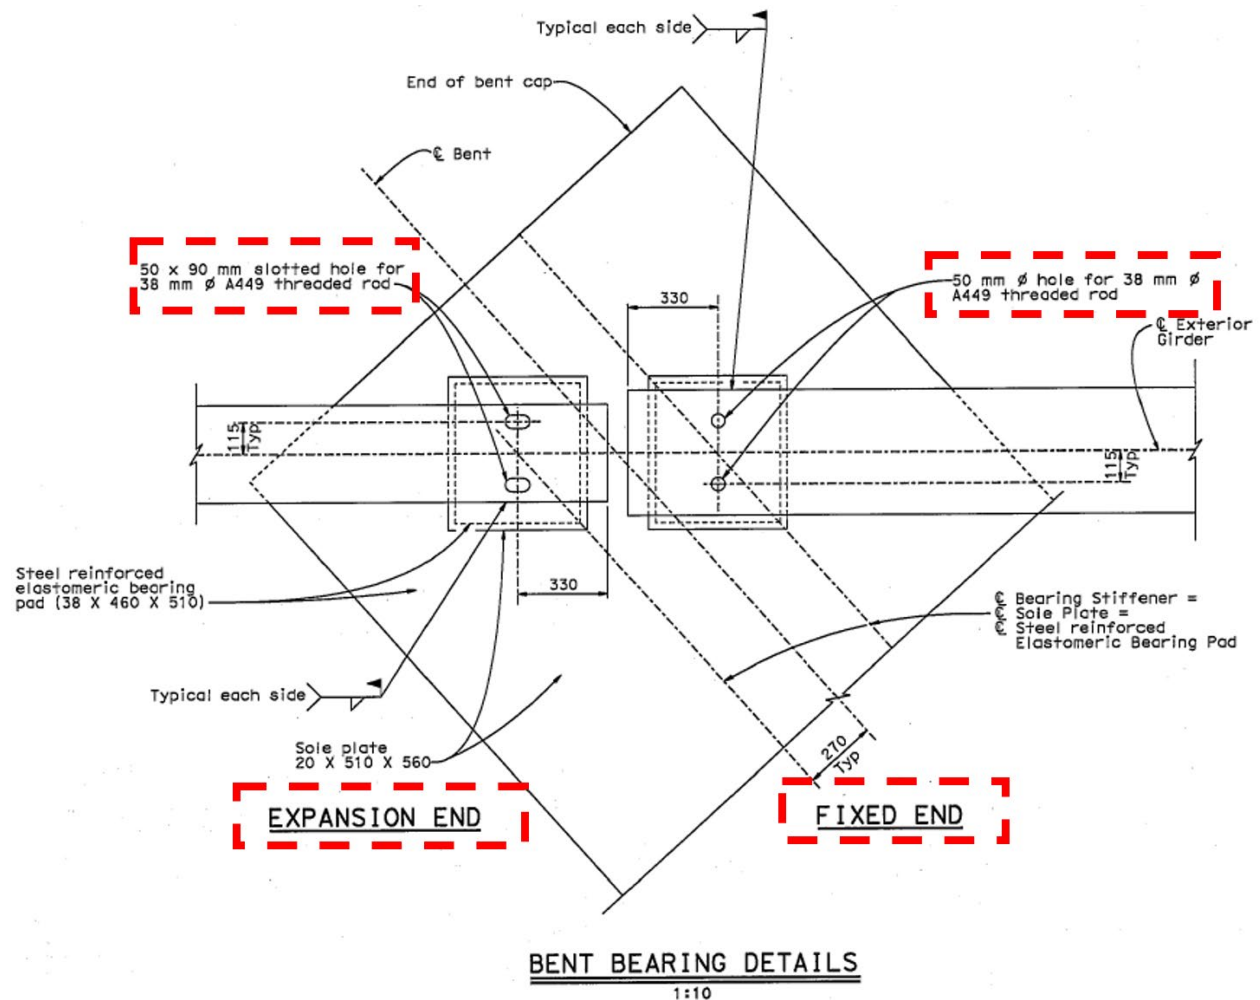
Differing Anchor Bolt Openings Due to Beam End Condition
